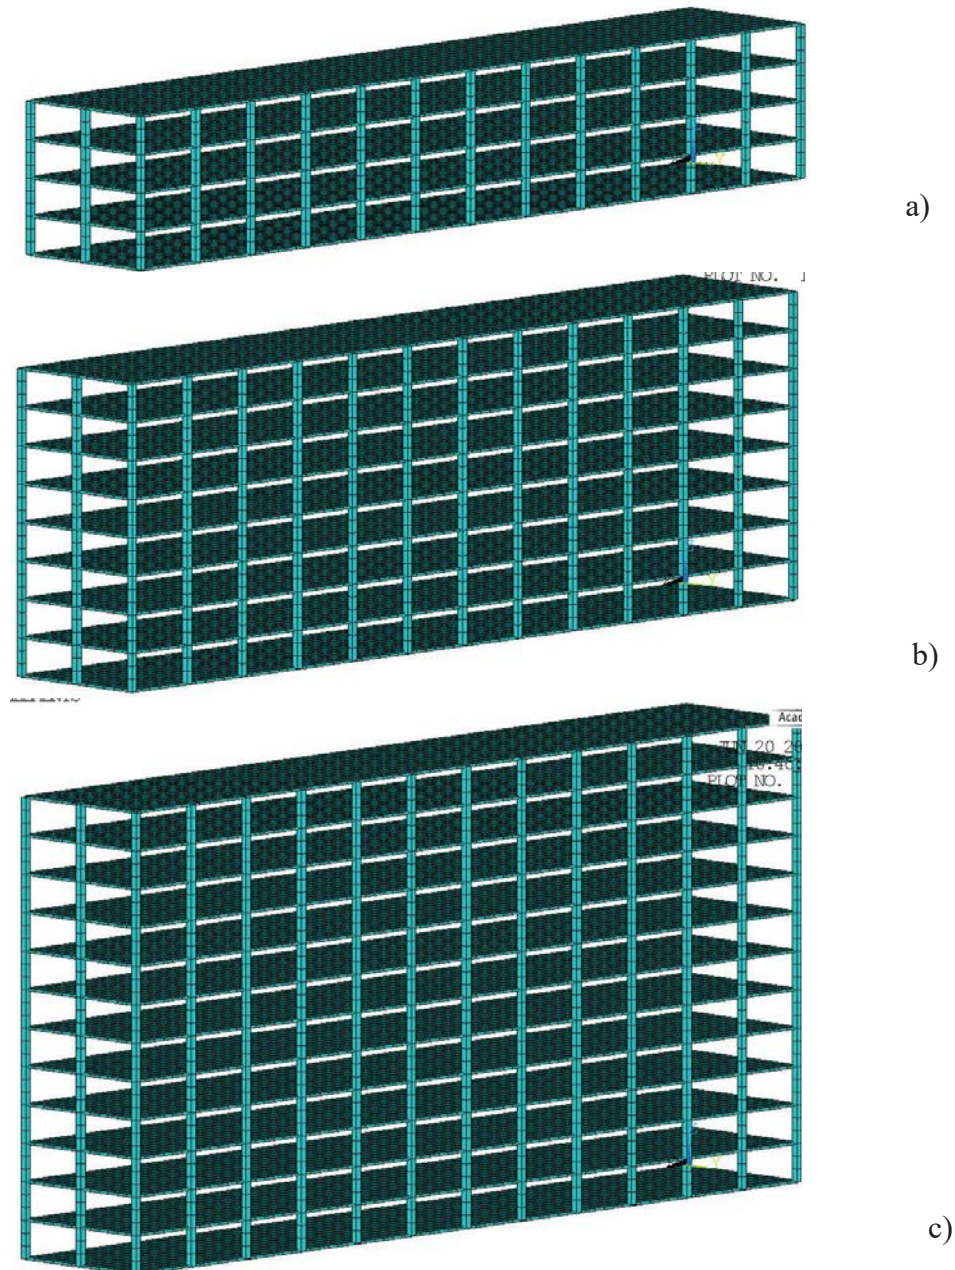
Office buildings with 2 x 12 floor bays and a) 4, b) 8, and c) 12 storeys.
